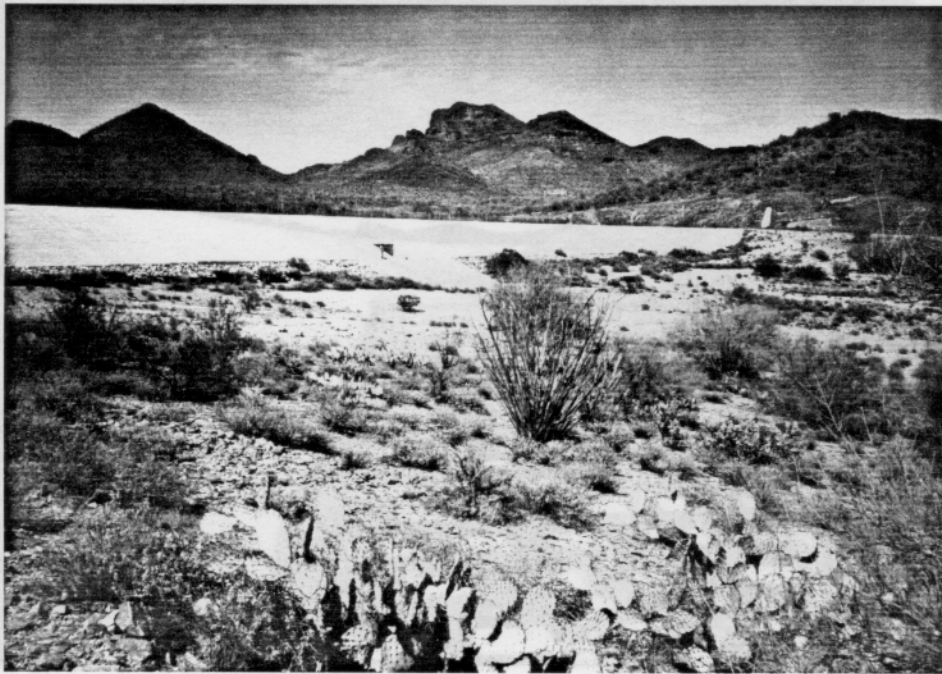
Upstream Slope of Spillway (view toward northeast).
